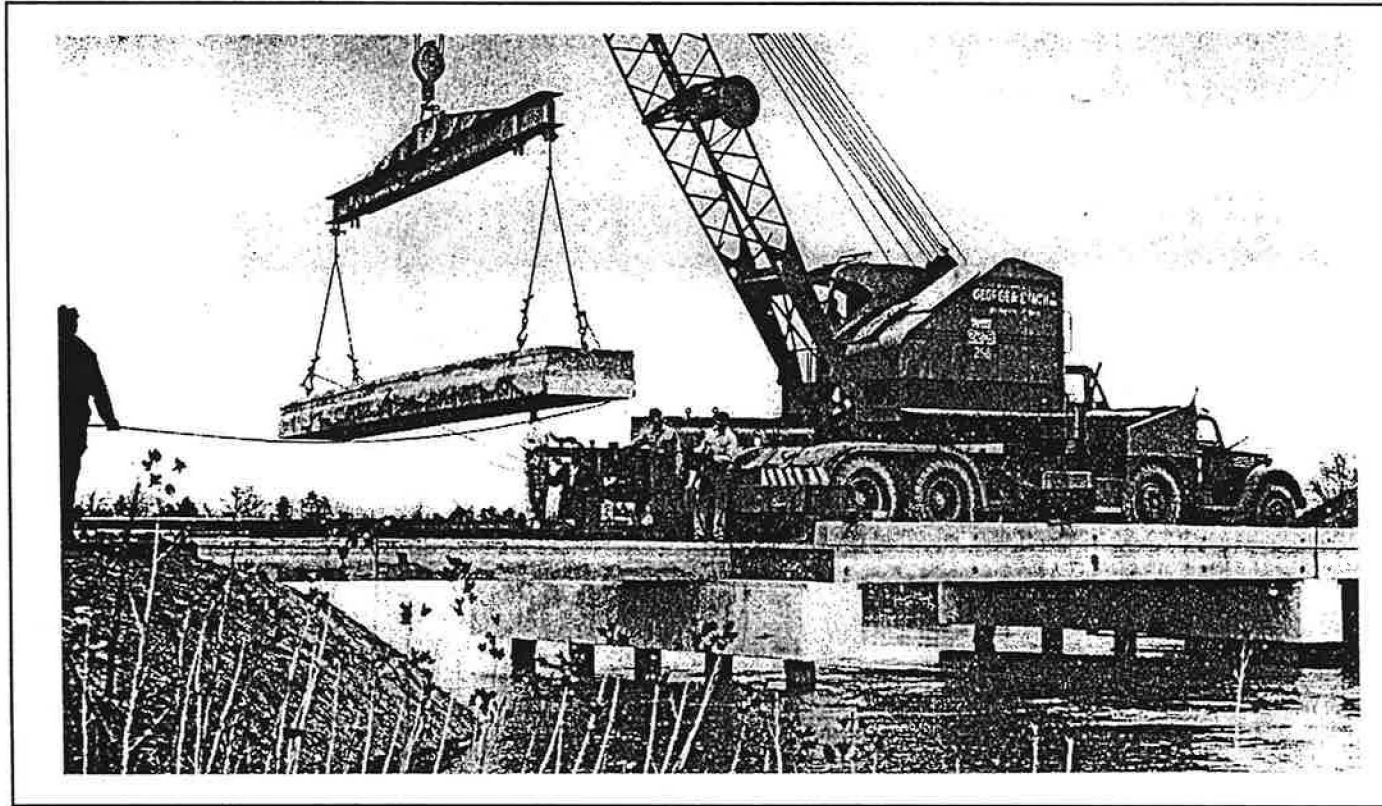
The Market Street over Murderkill River bridge (K-389A) in Frederica was the state's first prestressed concrete bridge. The precast box beams were fabricated by the Concrete Products Company of America at its shops in Pottstown, PA. Here one of the precast beams is lowered into place. The bridge was replaced in 1996. Source: Delaware State Highway Department, Annual Reports, 1954-55, p. 39.
